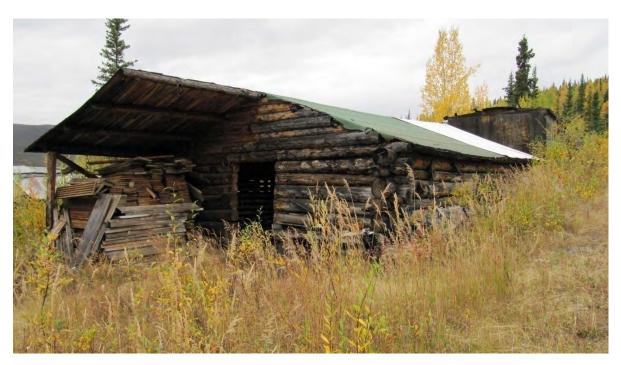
Site 1, view northwest of log structure [5]; note more recently constructed roof extension over front of the structure
